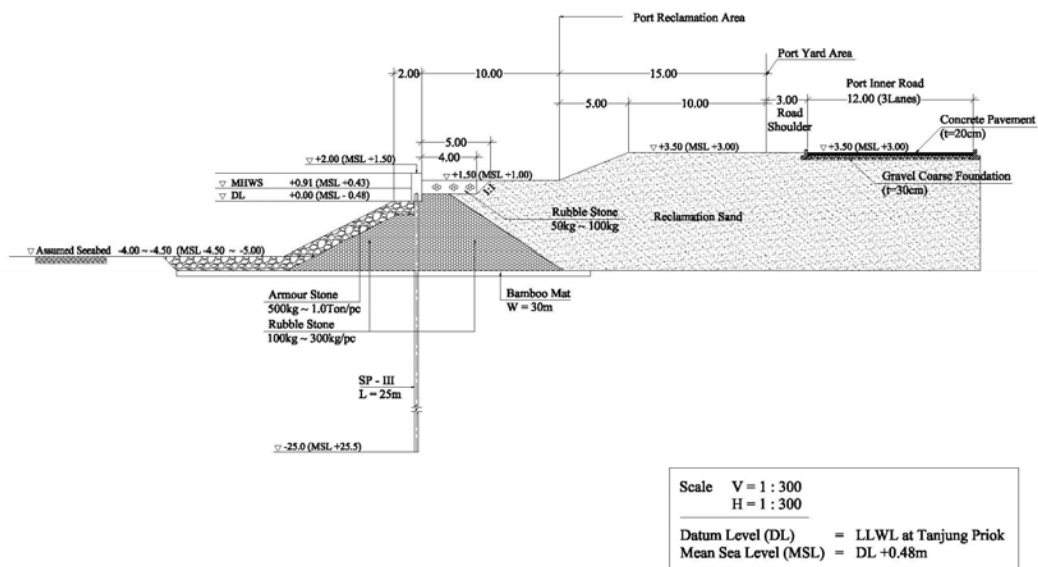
Typical Cross Section of North Side Seawall at North Kalibaru
